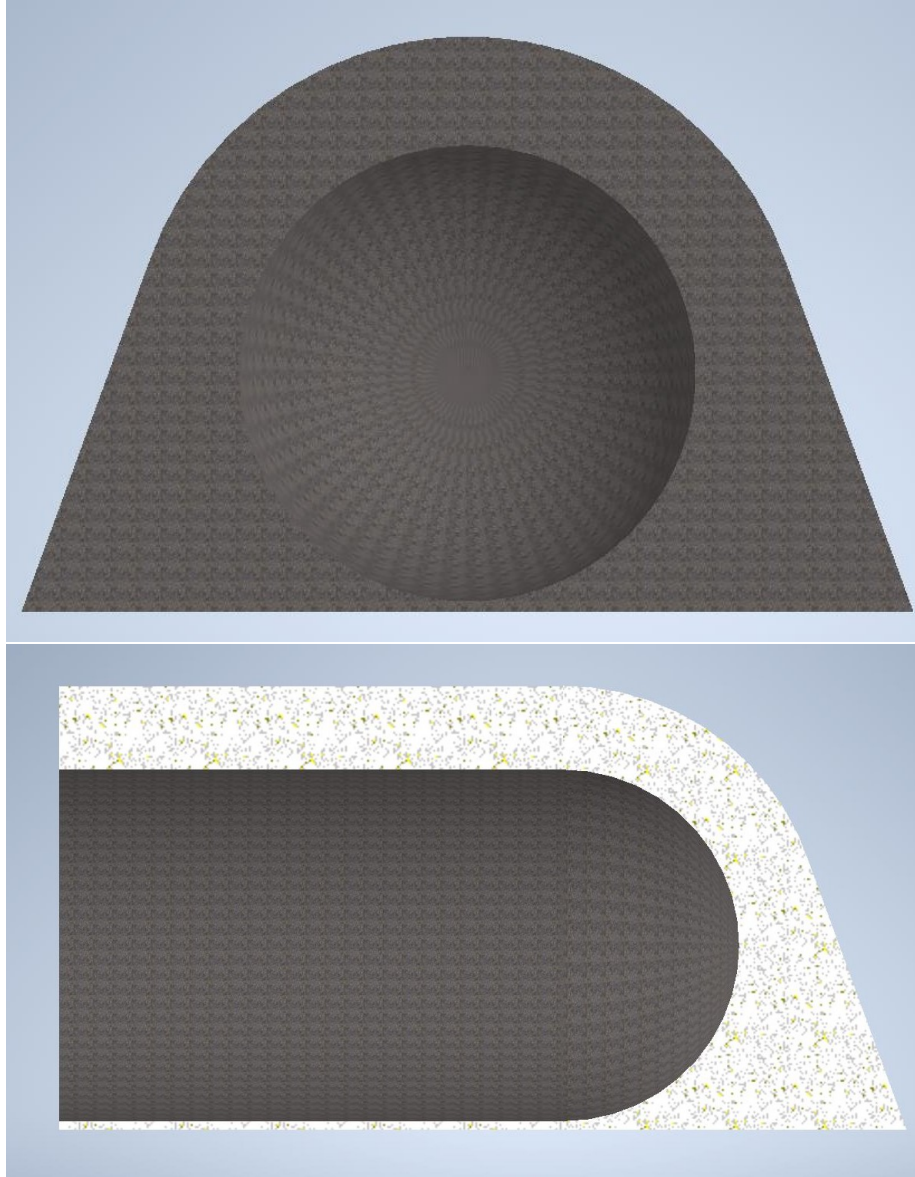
Regolith shielding manufactured with sintering. Top image is showing the front view and the lower image is showing the side view in half section.
